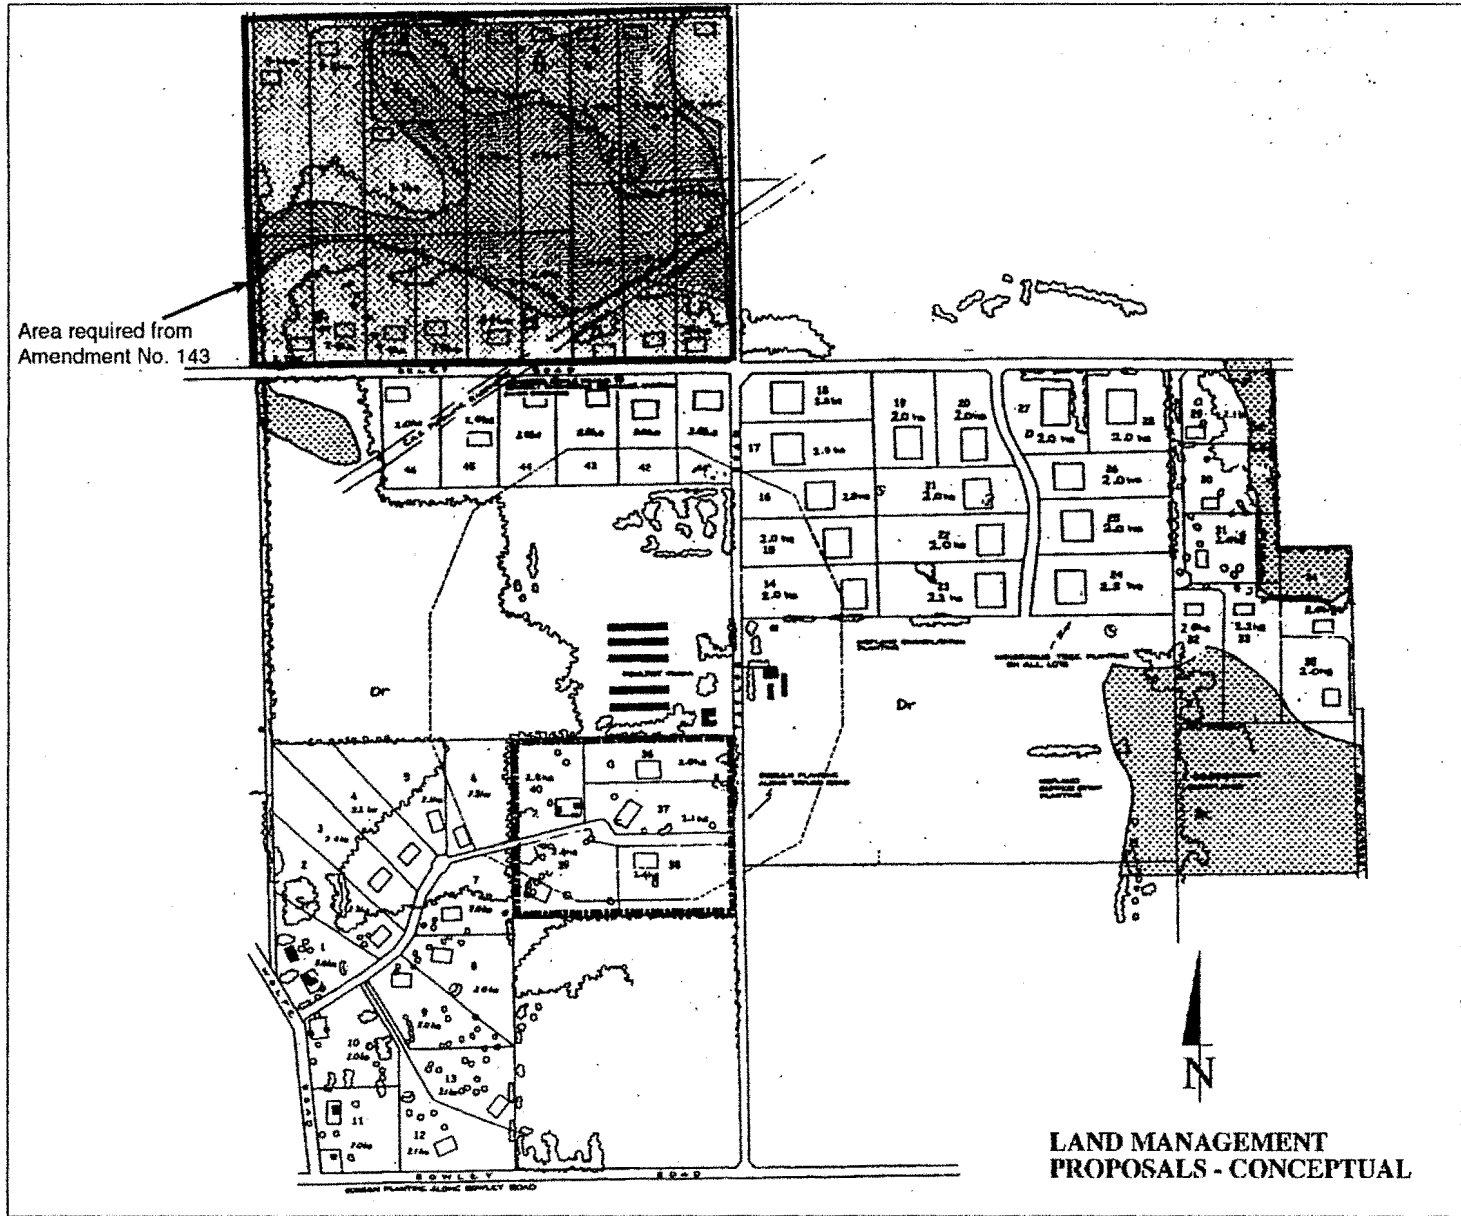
The proposed subdivision guide plan (Source: City of Armadale Environmental Review, 2001)
